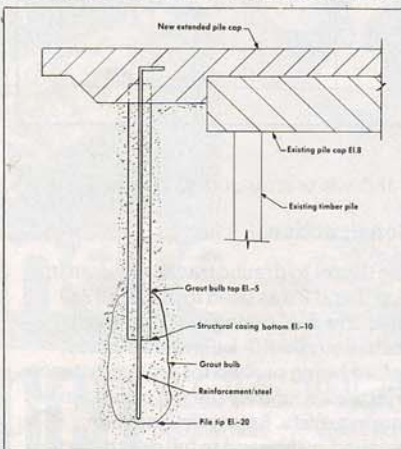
Minipile detail. Boylston St., Boston, MA.
